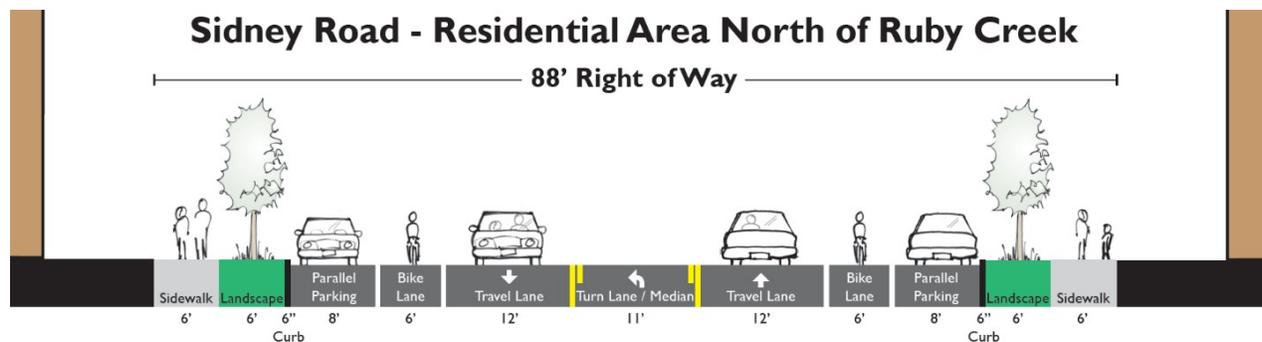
Sidney Road SW. This road section would be used in the center to the north of the Ruby Creek crossing.
